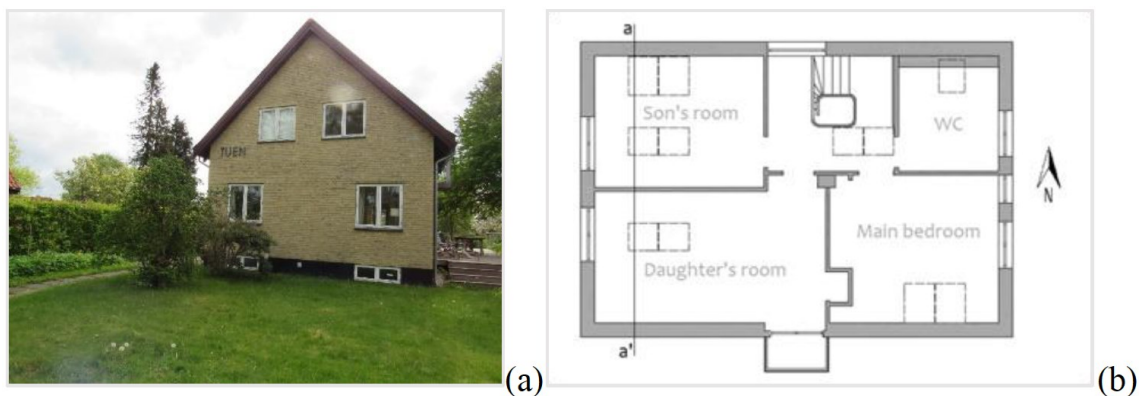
West side view of the a: examined case and b: floor plan of the upper floor.
